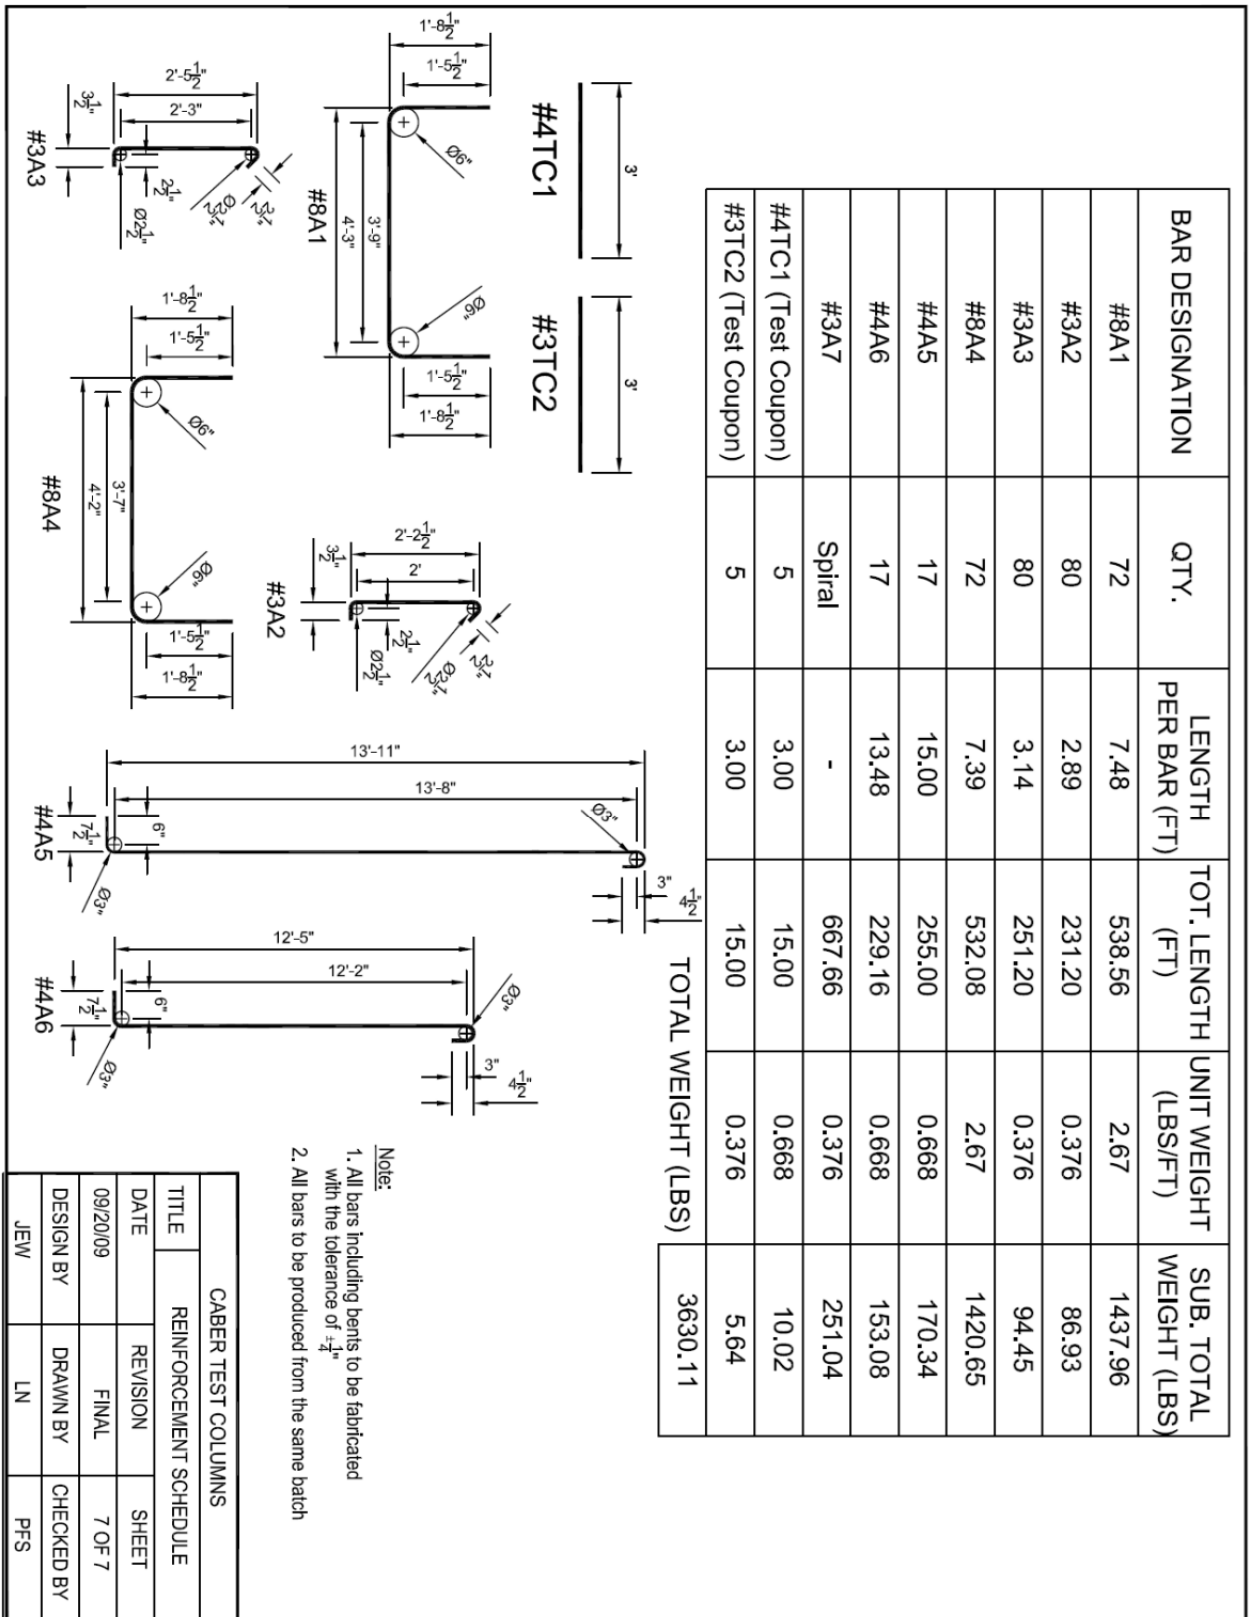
Reinforcement details of 1:3 scale bridge piers
